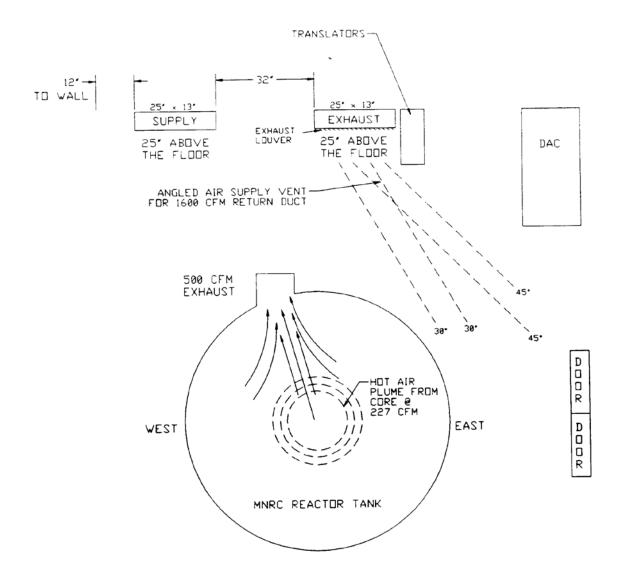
FLOOR PLAN OF REACTOR HALL SHOWING RELATION OF WALL MOUNTED AIR SUPPLY DUCT AND 500 CFM EXHAUST DUCT
